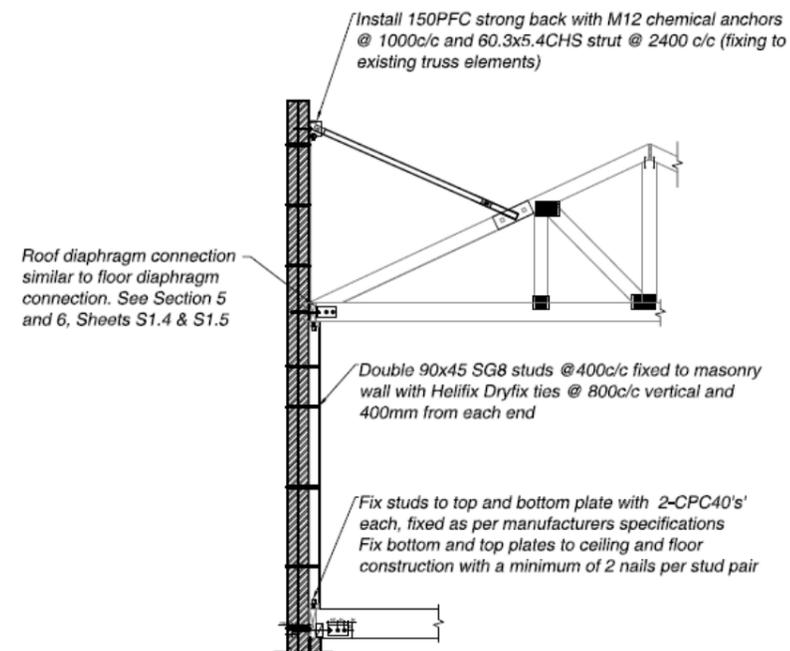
Parapet Tie back and URM Out of plane restraint typical remedial detail
